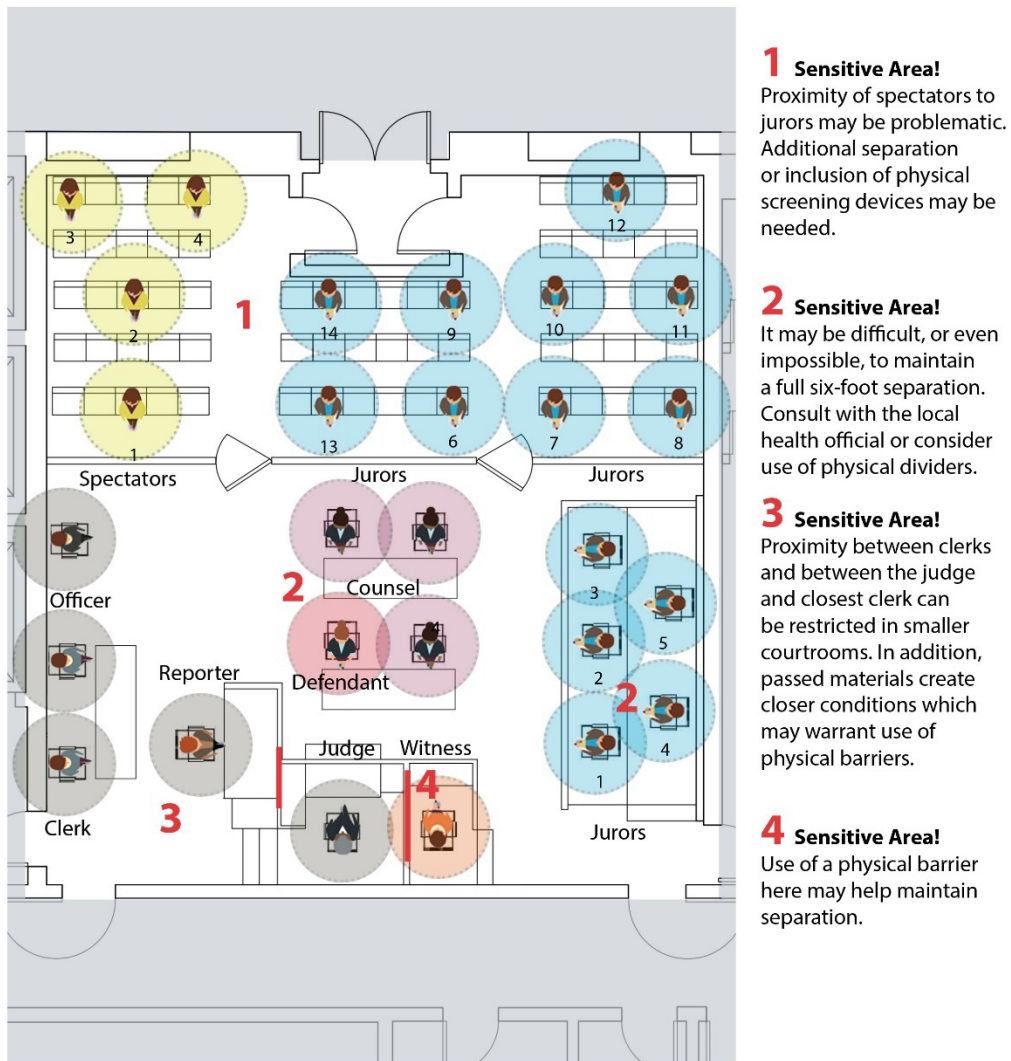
Potential Jury Arrangement for a Typical Courtroom
